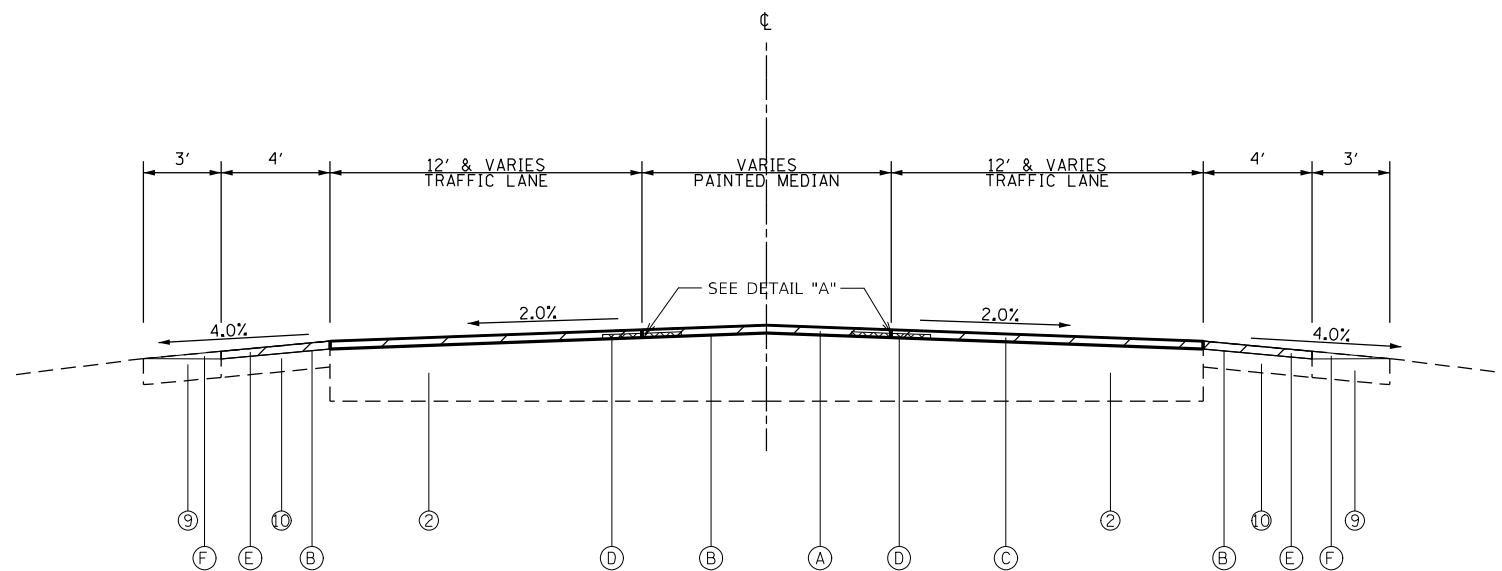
DETAIL "A" SHALL BE APPLIED ALONG THE LANE JOINTS OF PAVEMENT
